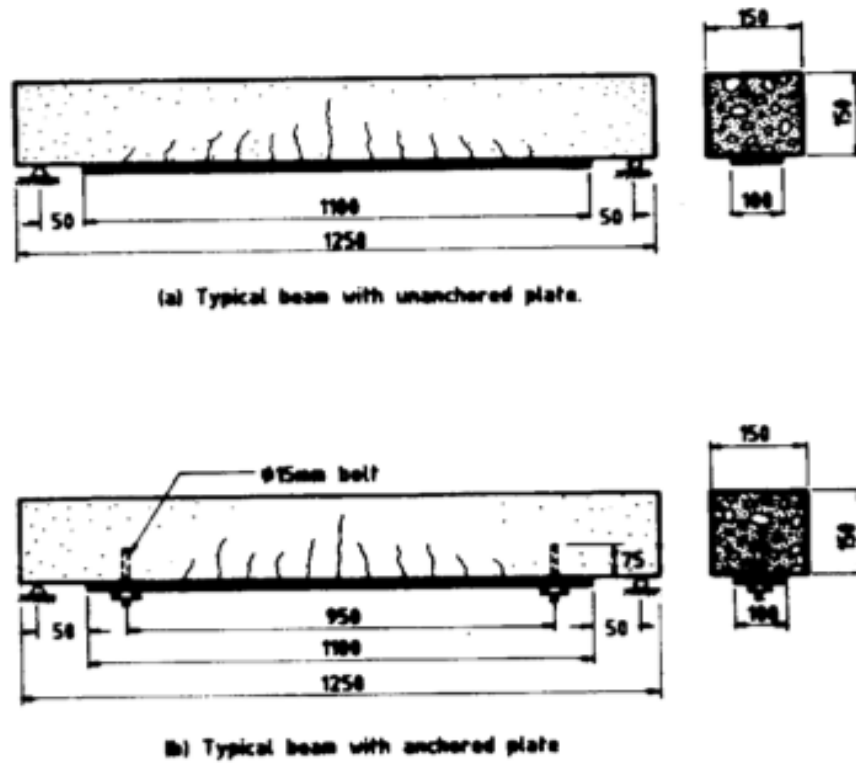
2- Strengthening detail of two typical beams, one with anchored plate and another with unanchored plate (Hussain et al. 1995).
